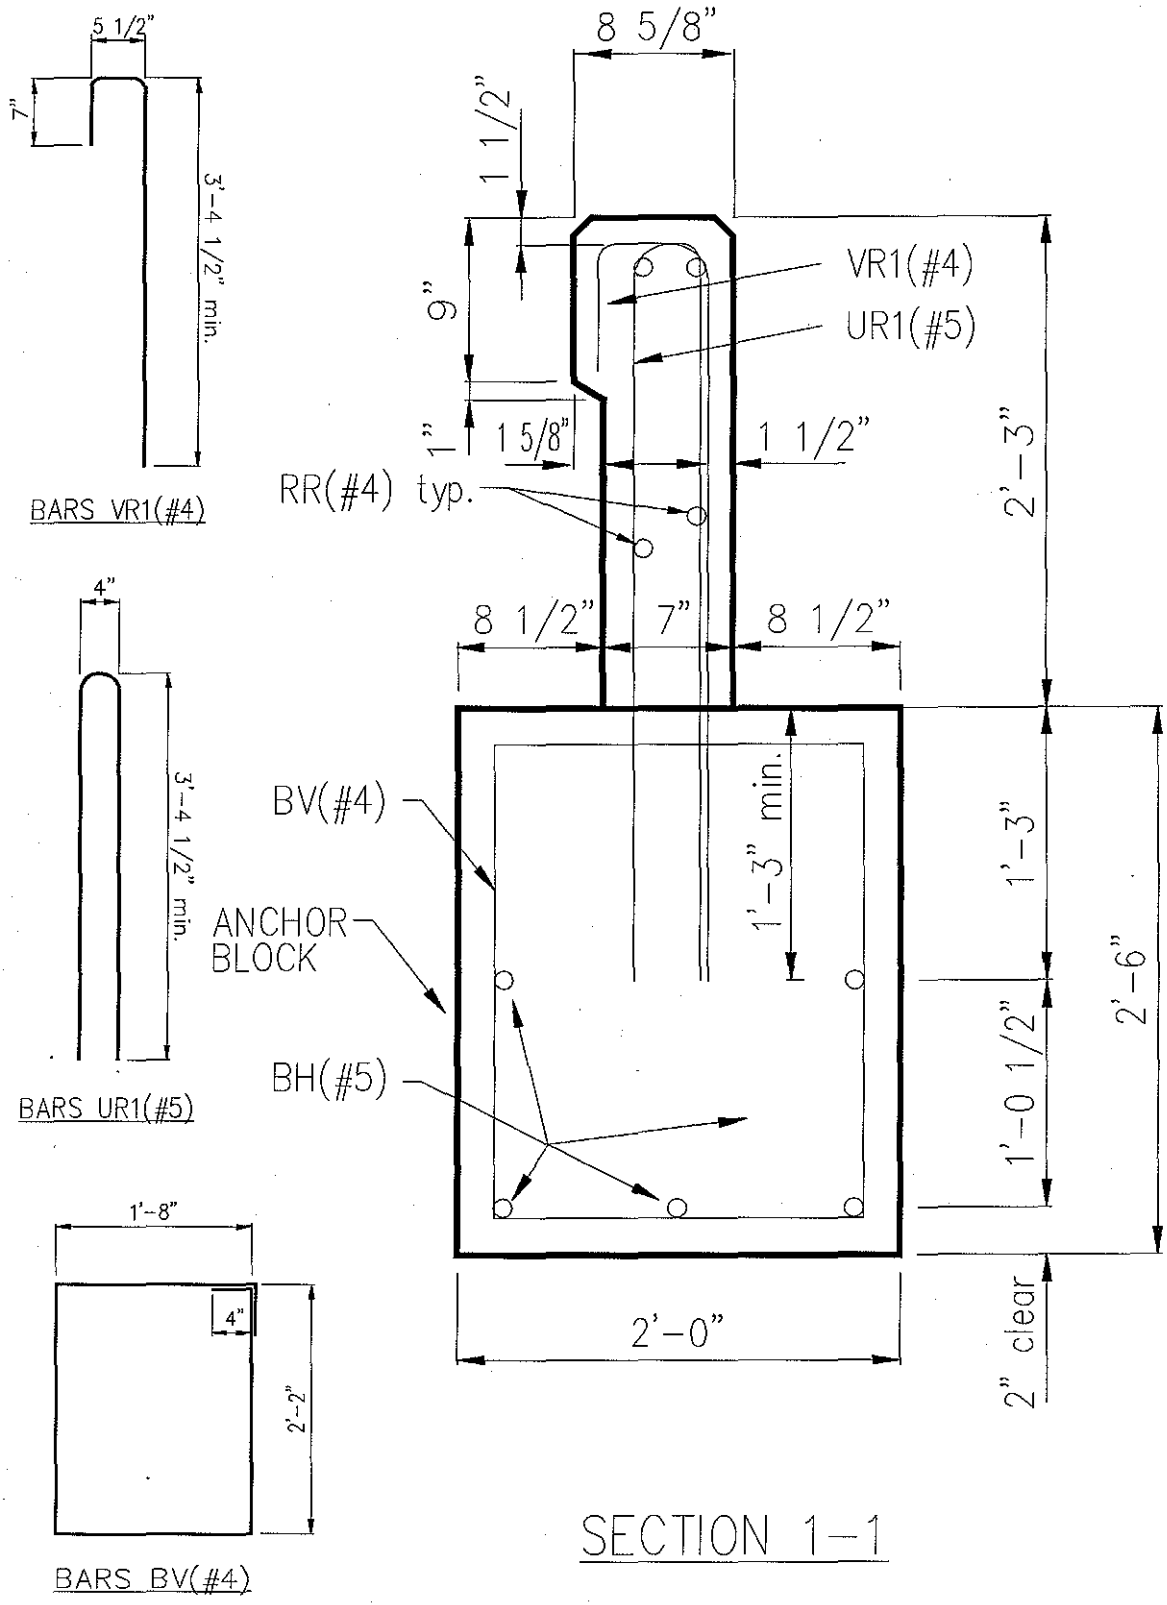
T201 TRAFFIC RAIL (VERTICAL WALL)
